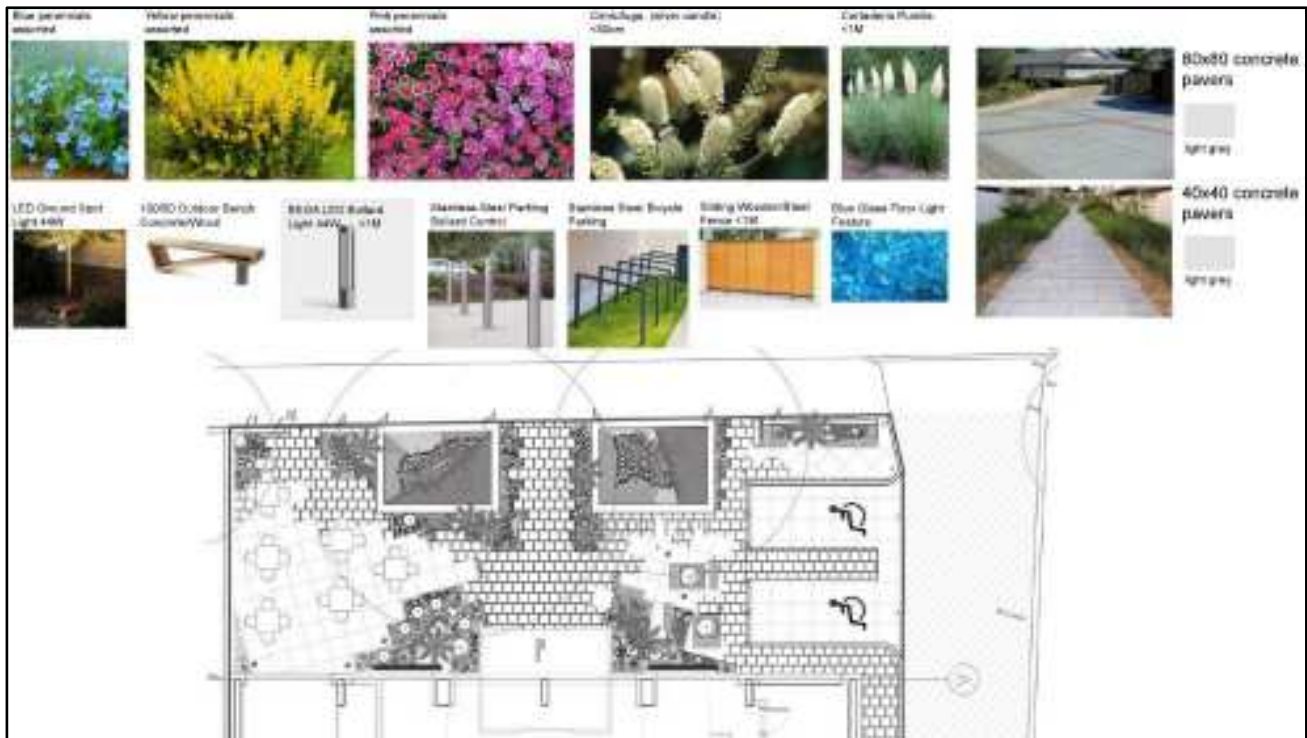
Landscaping Plan (Extracted from the submitted D&A Statement)
